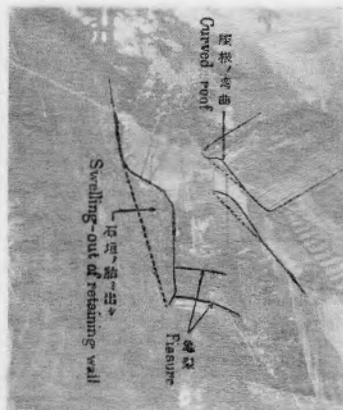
Broken houses and swelled out retaining wall on the fissure line.
